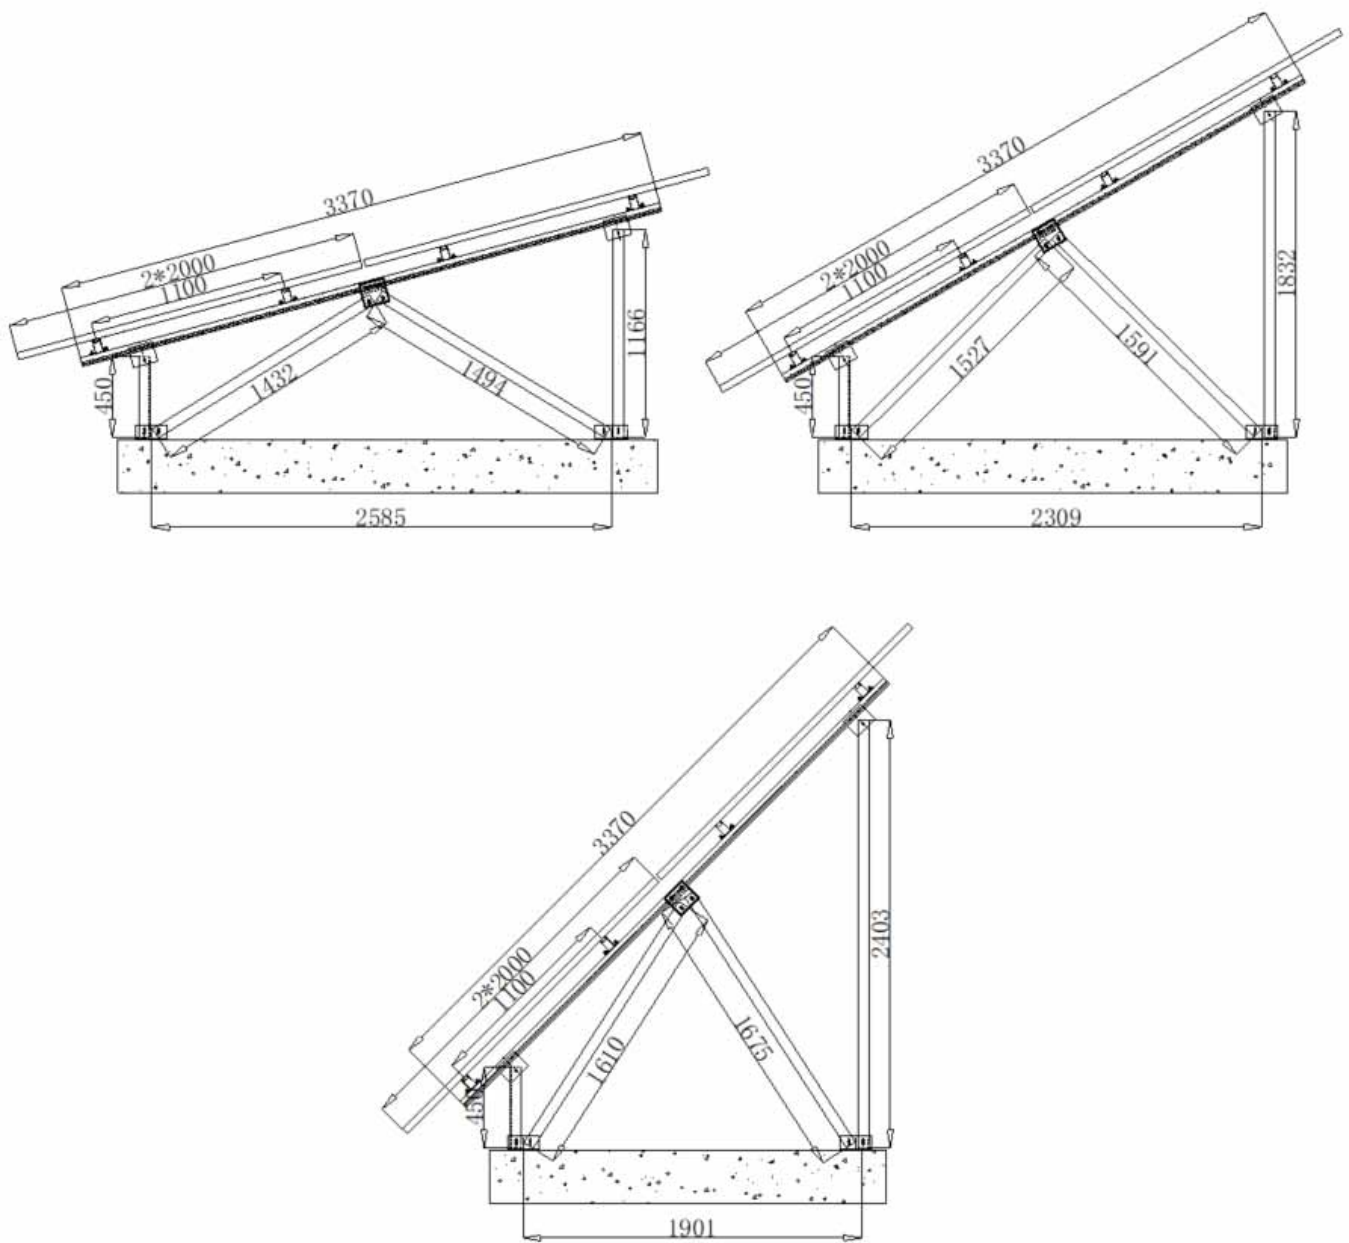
PV Panel 2000x1100mm with Concrete Footing Details
